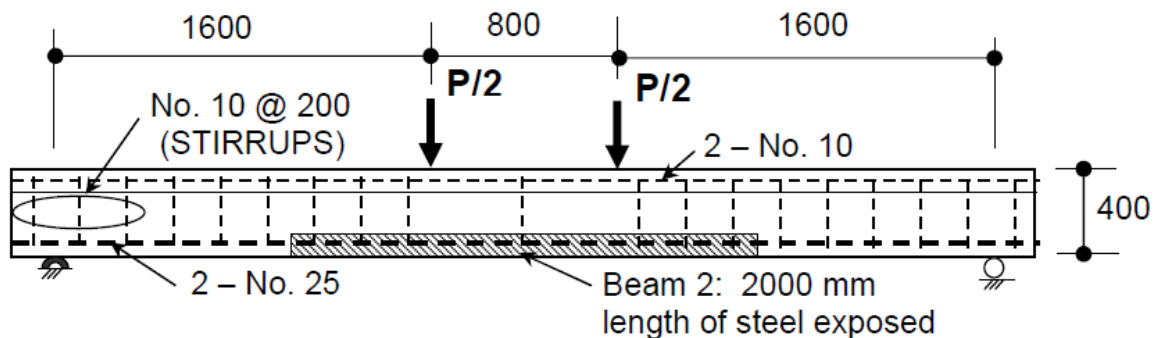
Details of Test Specimens and Loading Configuration (Bartlett 1998).
